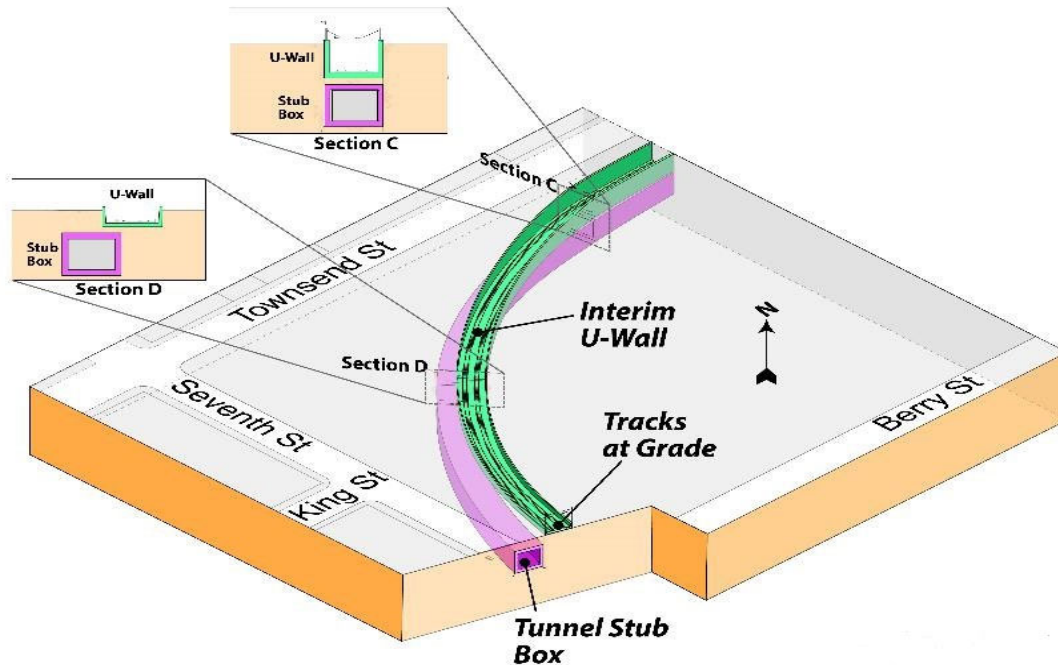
2018 Tunnel Stub Box at Caltrain Railyard
